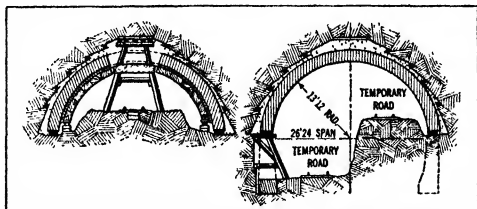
METHOD OF EXCAVATION OF ST GOTTHARD TUNNEL
